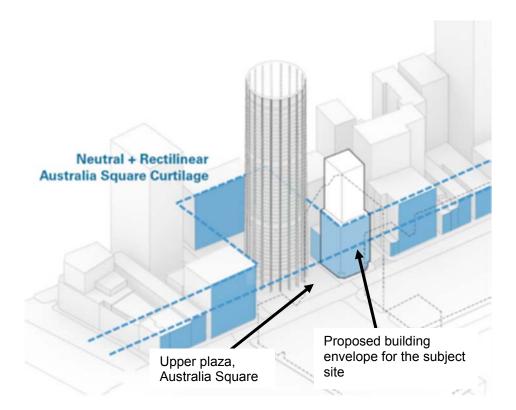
Bird's eye view showing building blocks on the eastern side of George Street.
